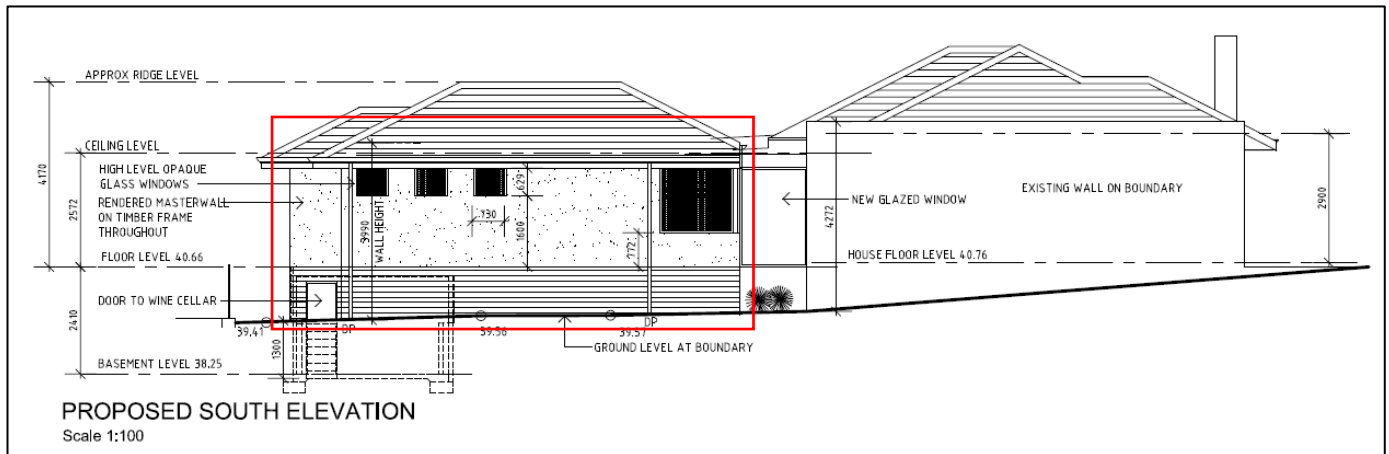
Proposed Timber cladding (Southern Elevation - Front)
